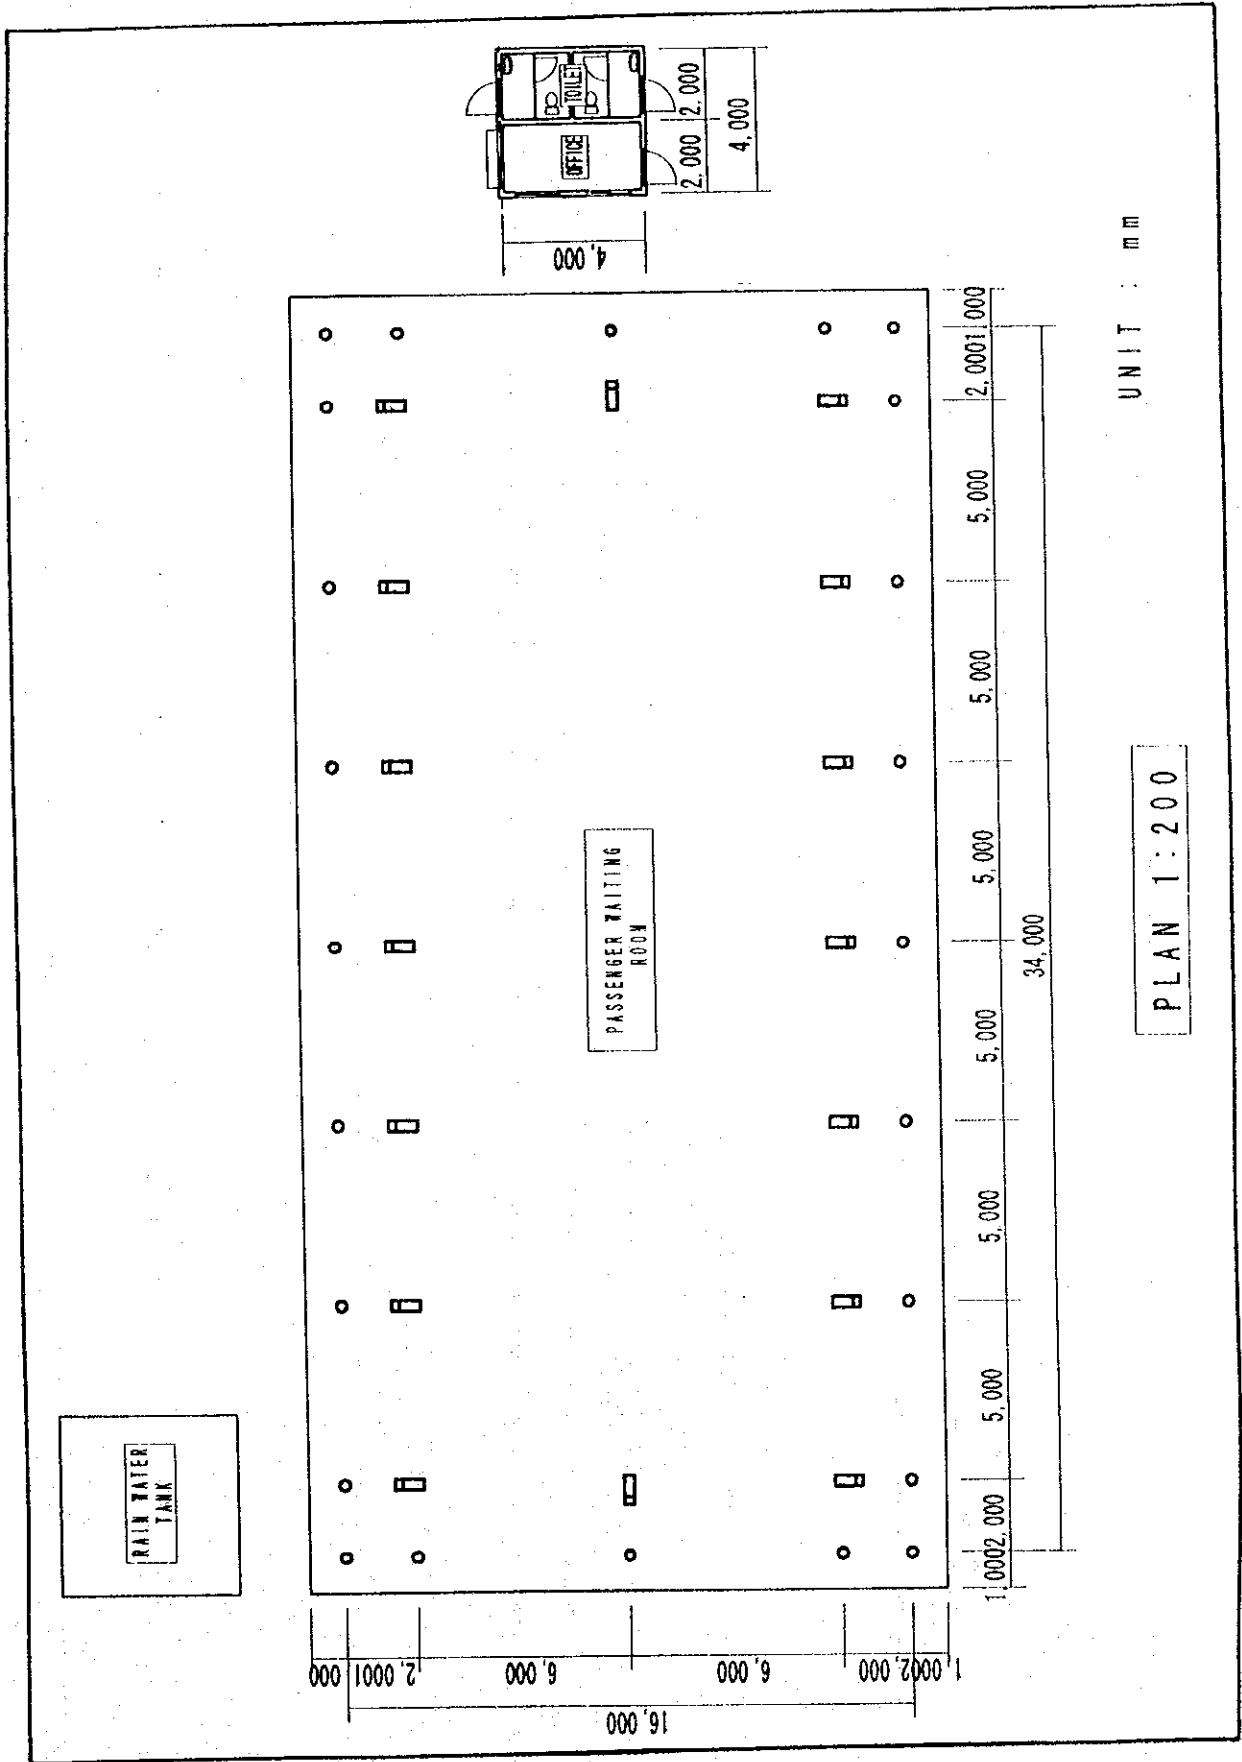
(1) General Layout Plan of Passenger Terminal
